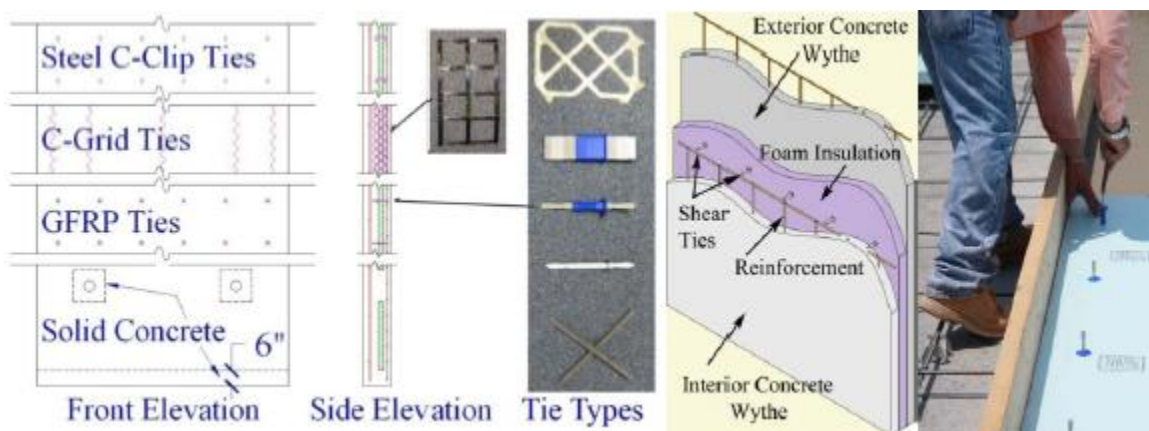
Sandwich Wall Panel (Naito et al. 10)
